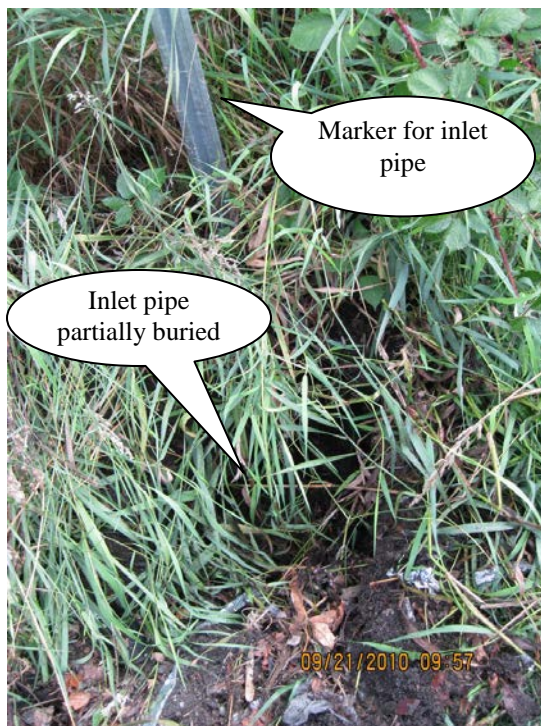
Inlet pipe partially buried, (Point C, Operational Plan)
